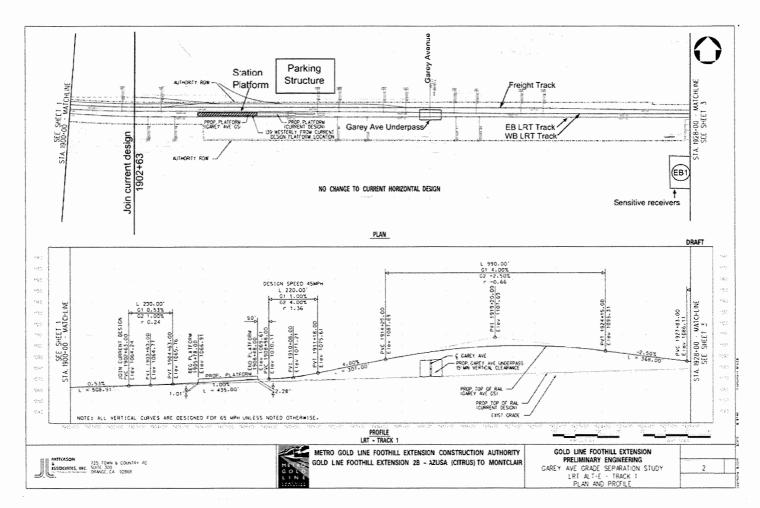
Plan and Profile of Garey Avenue LRT Bridge (Page 1)
